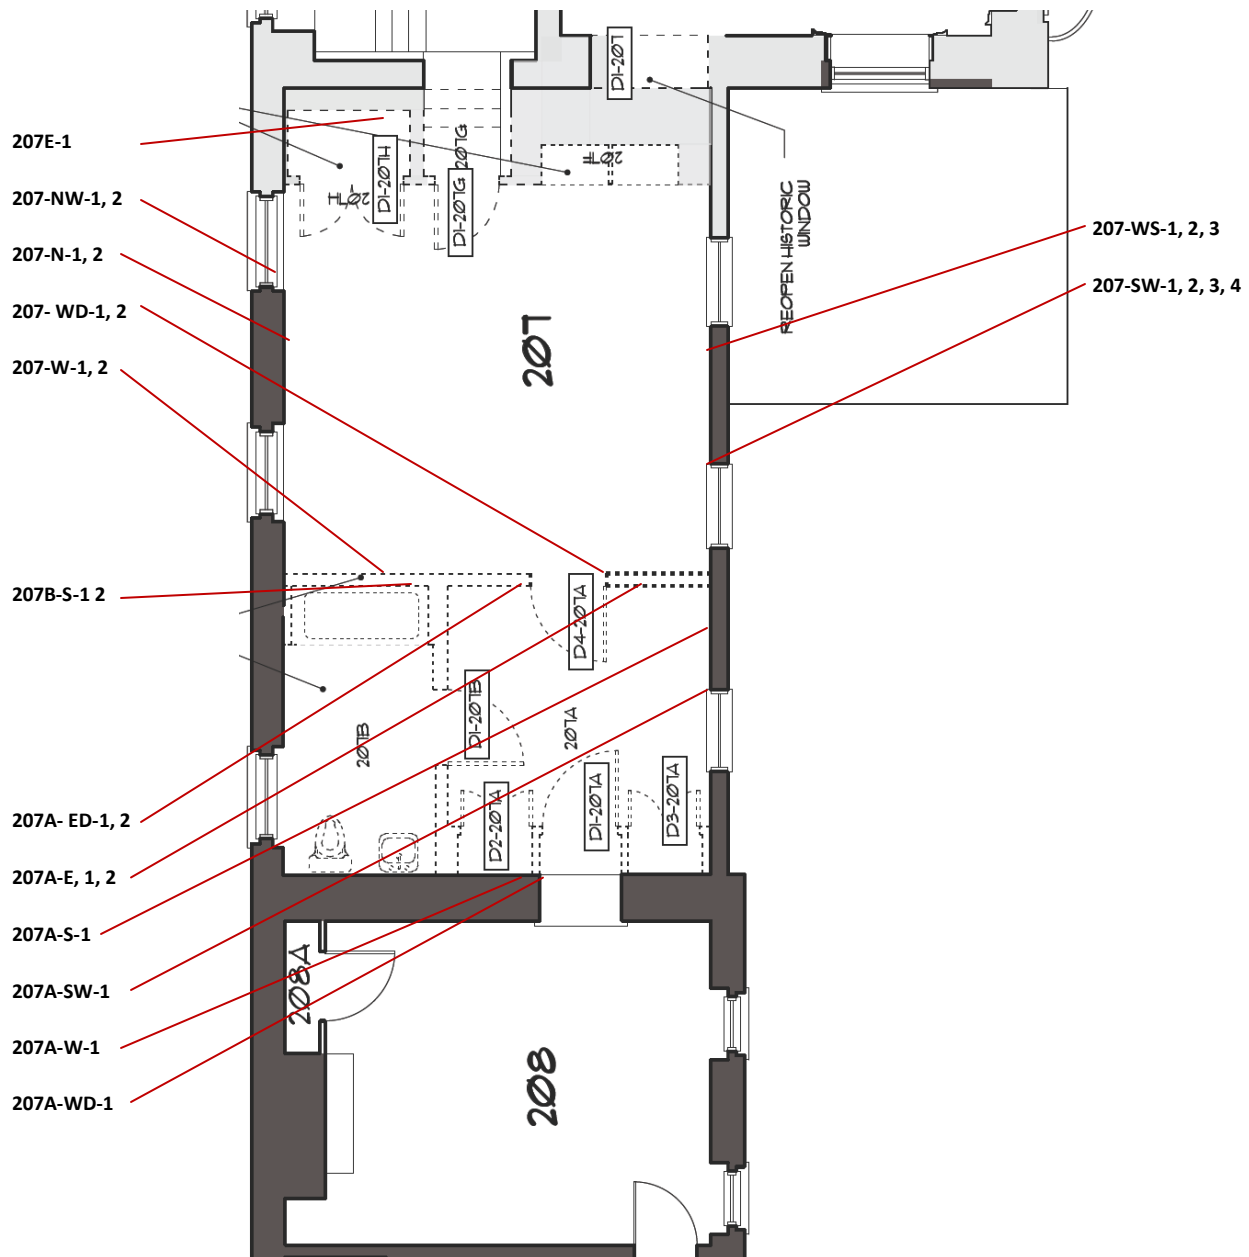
Sample area notations on second floor plans drawn by Glenn Keyes Architects.
